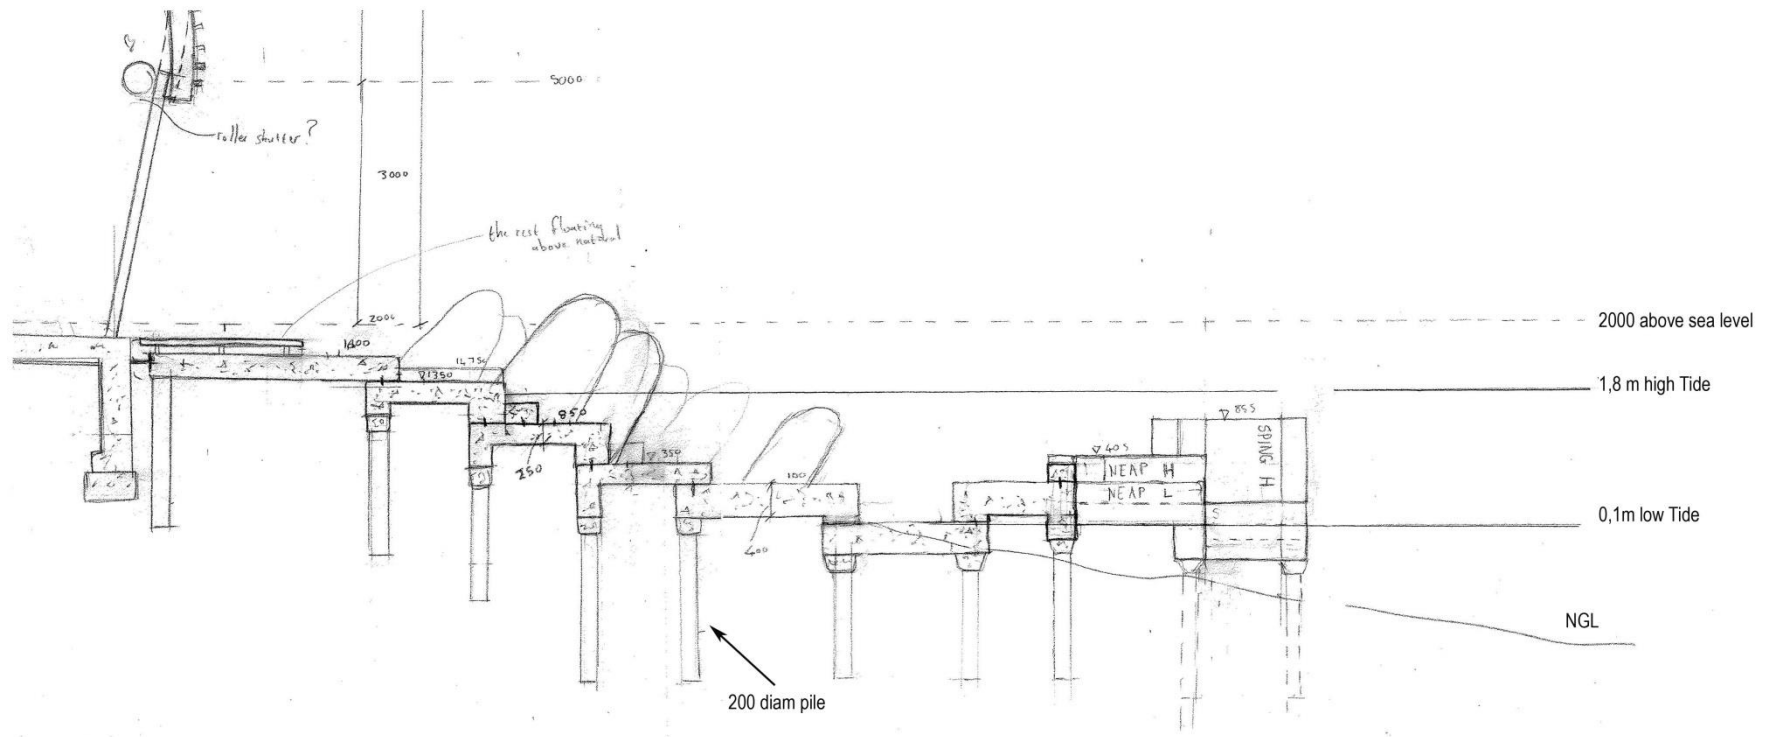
1:50 Section of concrete platforms on concrete piles. Their depth depends on the bed rock level. (not to scale) (Author, 2013)
